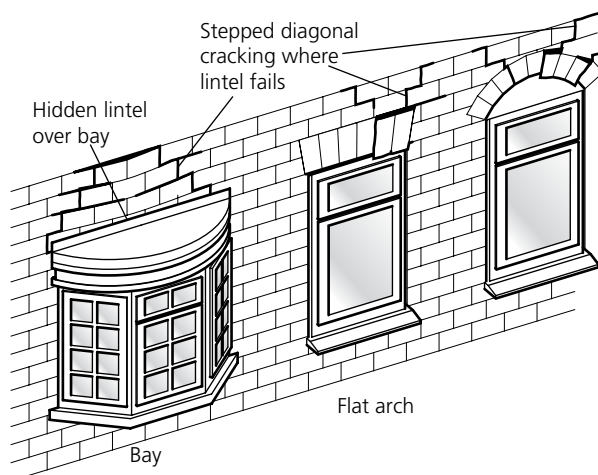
Diagonal cracking associated with lintel failure
